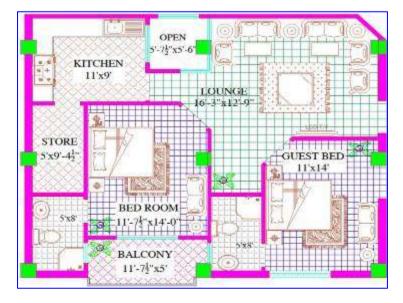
a: 2-Bed Room Apartment (Single Flat)
